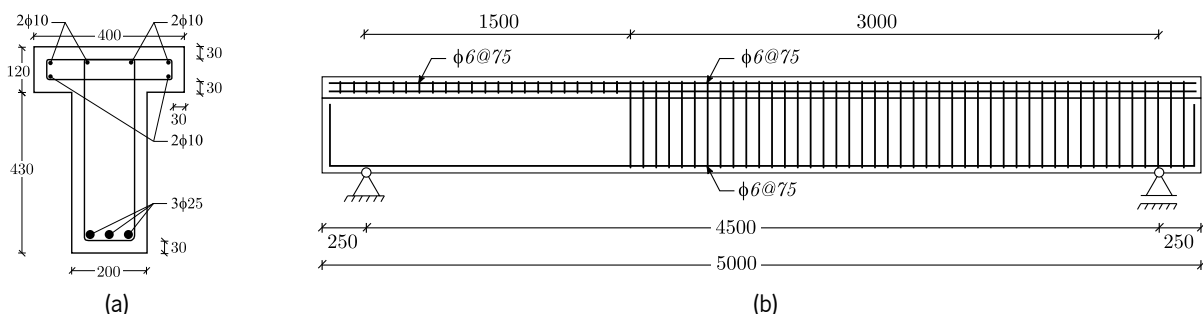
Geometry of the beam: (a) cross section and (b) lateral view (dimensions in mm).
